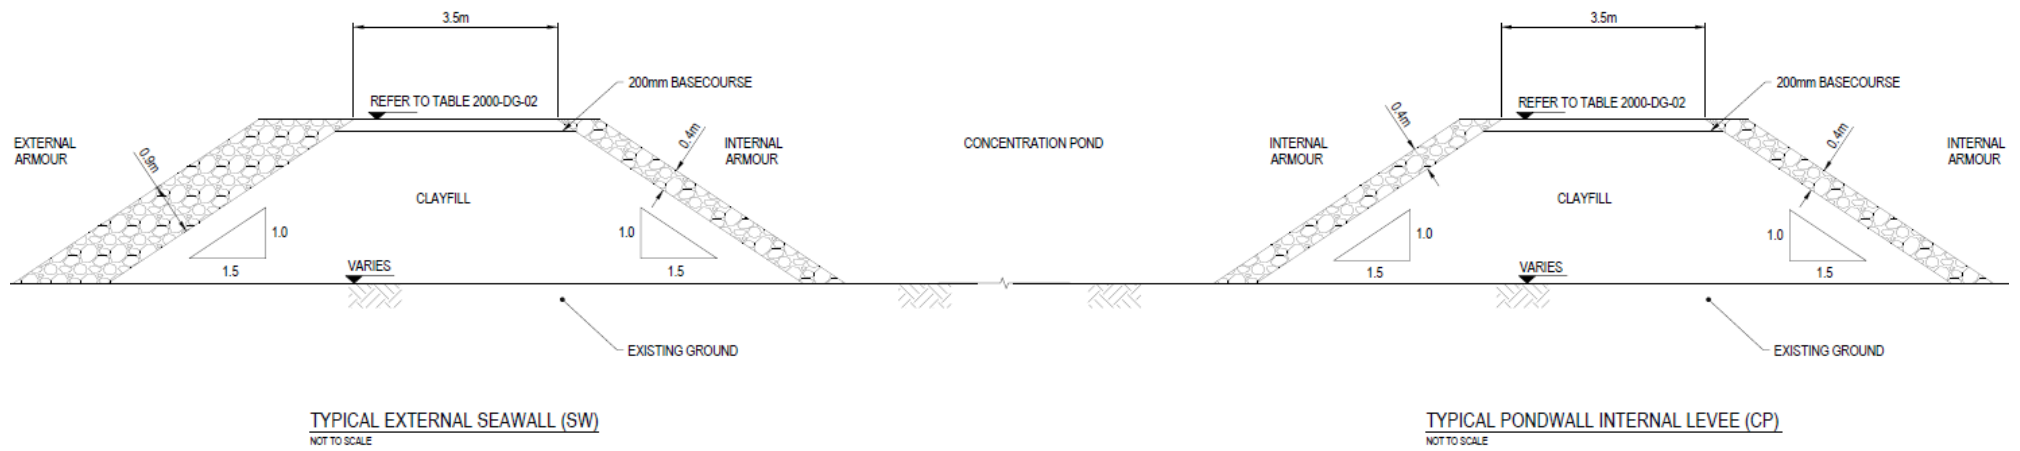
Typical Evaporation Pond Embankment Cross Sections
